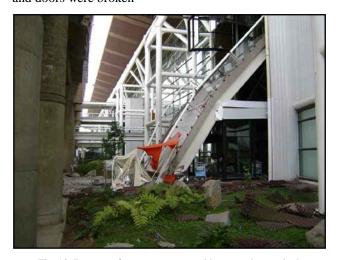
Damage of overpass connected between the terminal and the raised access road (Public Works Chile photo)
